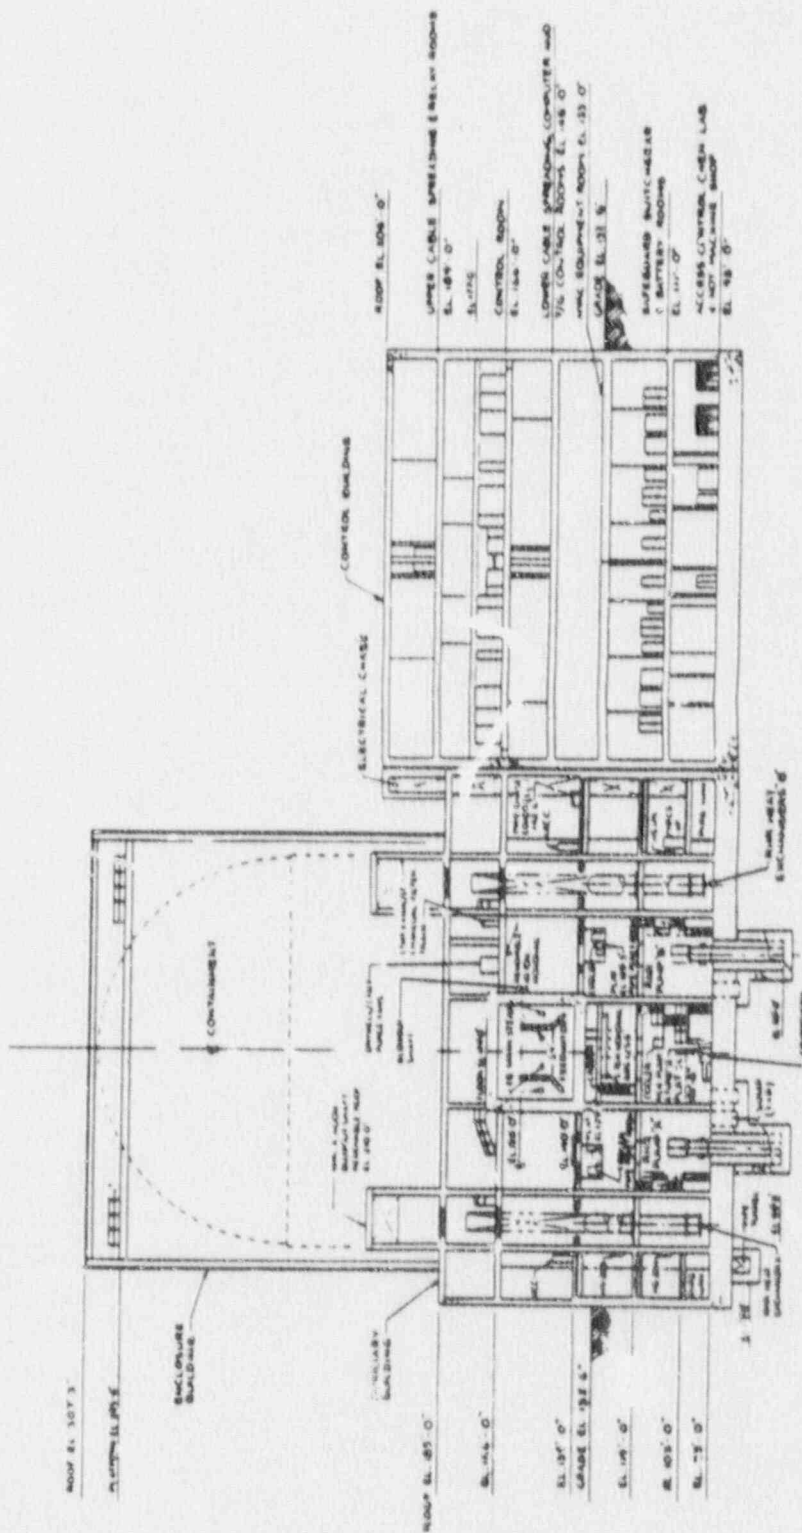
Elevation View of Grand Gulf Reactor and Control Buildings (looking west)
